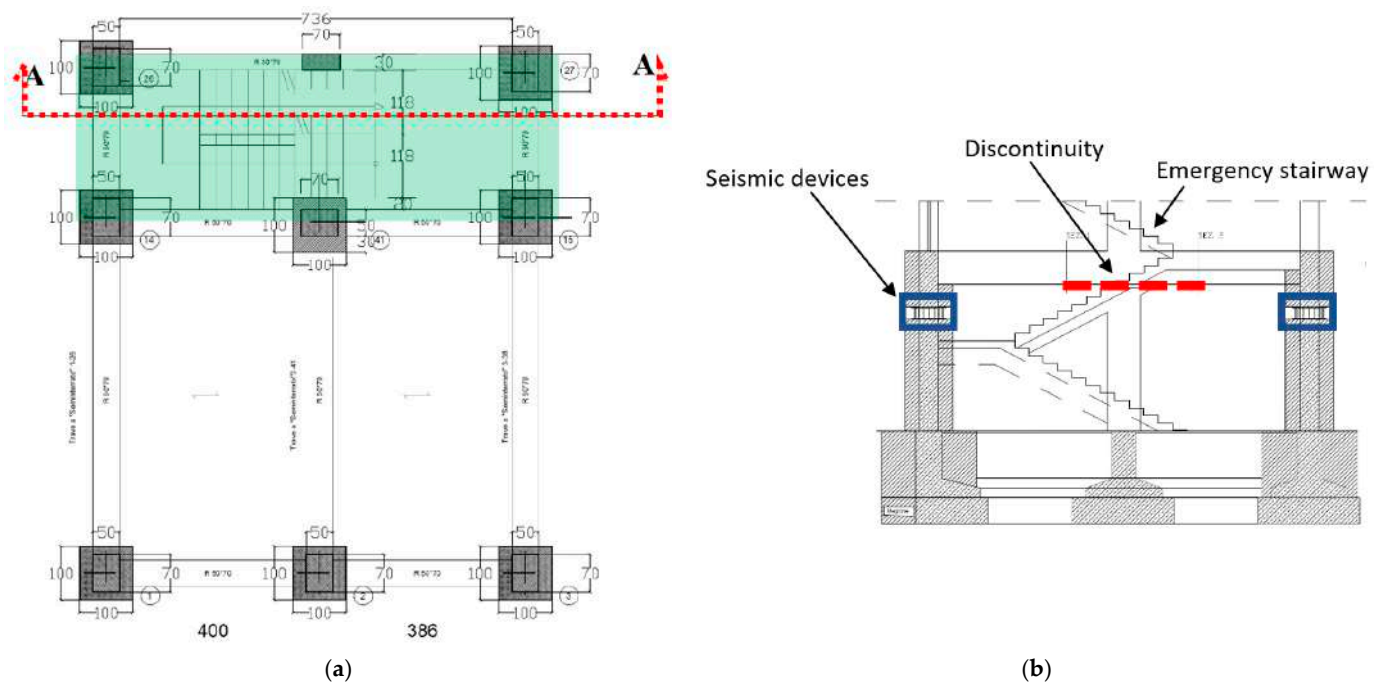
Detail of seismic joint in the region of emergency stairway: (a) plan view (dimensions in cm) and (b) vertical cross-section (detail of foundation level).
